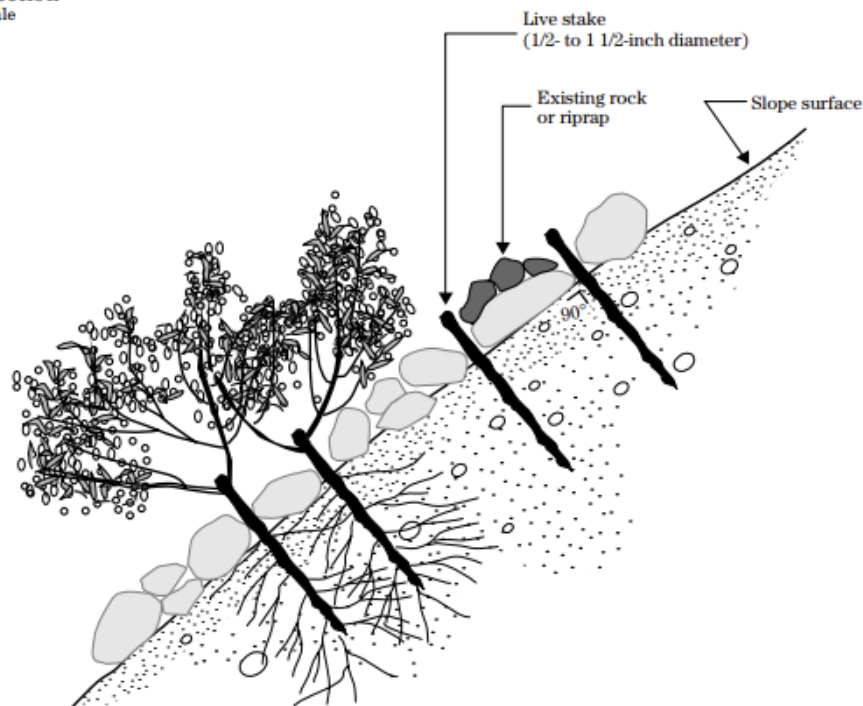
C: Joint planting details. Source: NRCS (1996).
